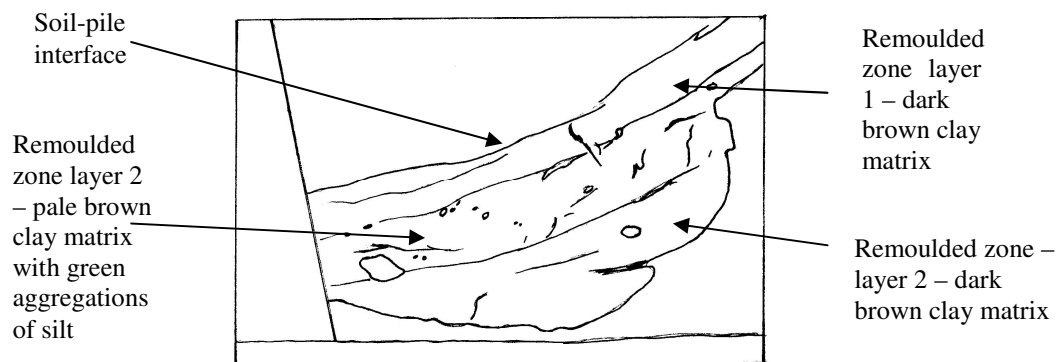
Zoning of remoulding with the soil surrounding pile MR3 860-1210mm below ground level. Then soils is viewed from above, and the pile would have been at the top of this picture
